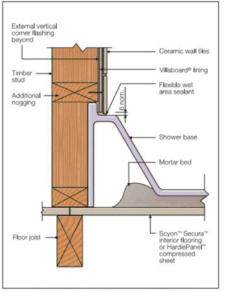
PREFORMED TRAY DETAIL FOR VILLABOARD LINING
